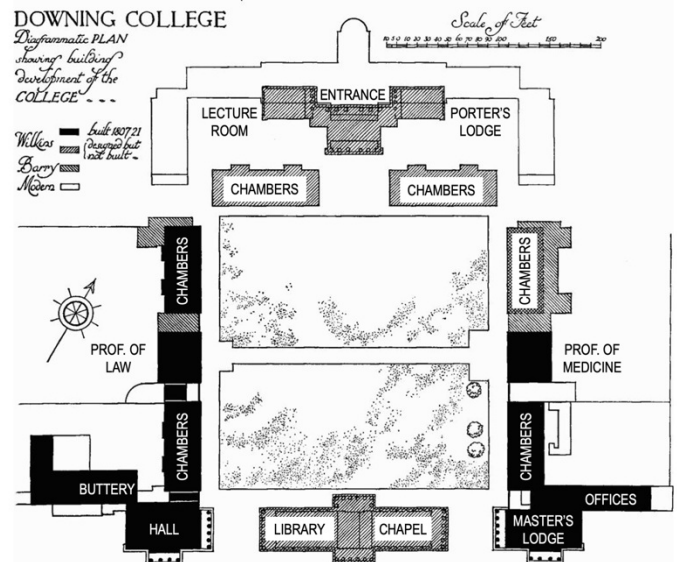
Plan of Downing College showing Wilkins' designs built (black) and not built (left diagonal hachures). Later additions by Barry and modern buildings are also shown. After a plan of Downing College by British History Online.
